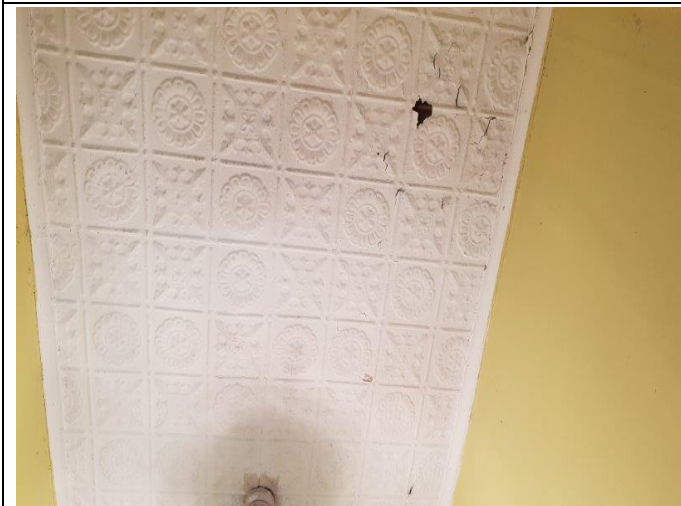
59 Cowper Street, Dwelling - Interior, Compressed metal ceiling, lead containing white paint (WSP-104436).
